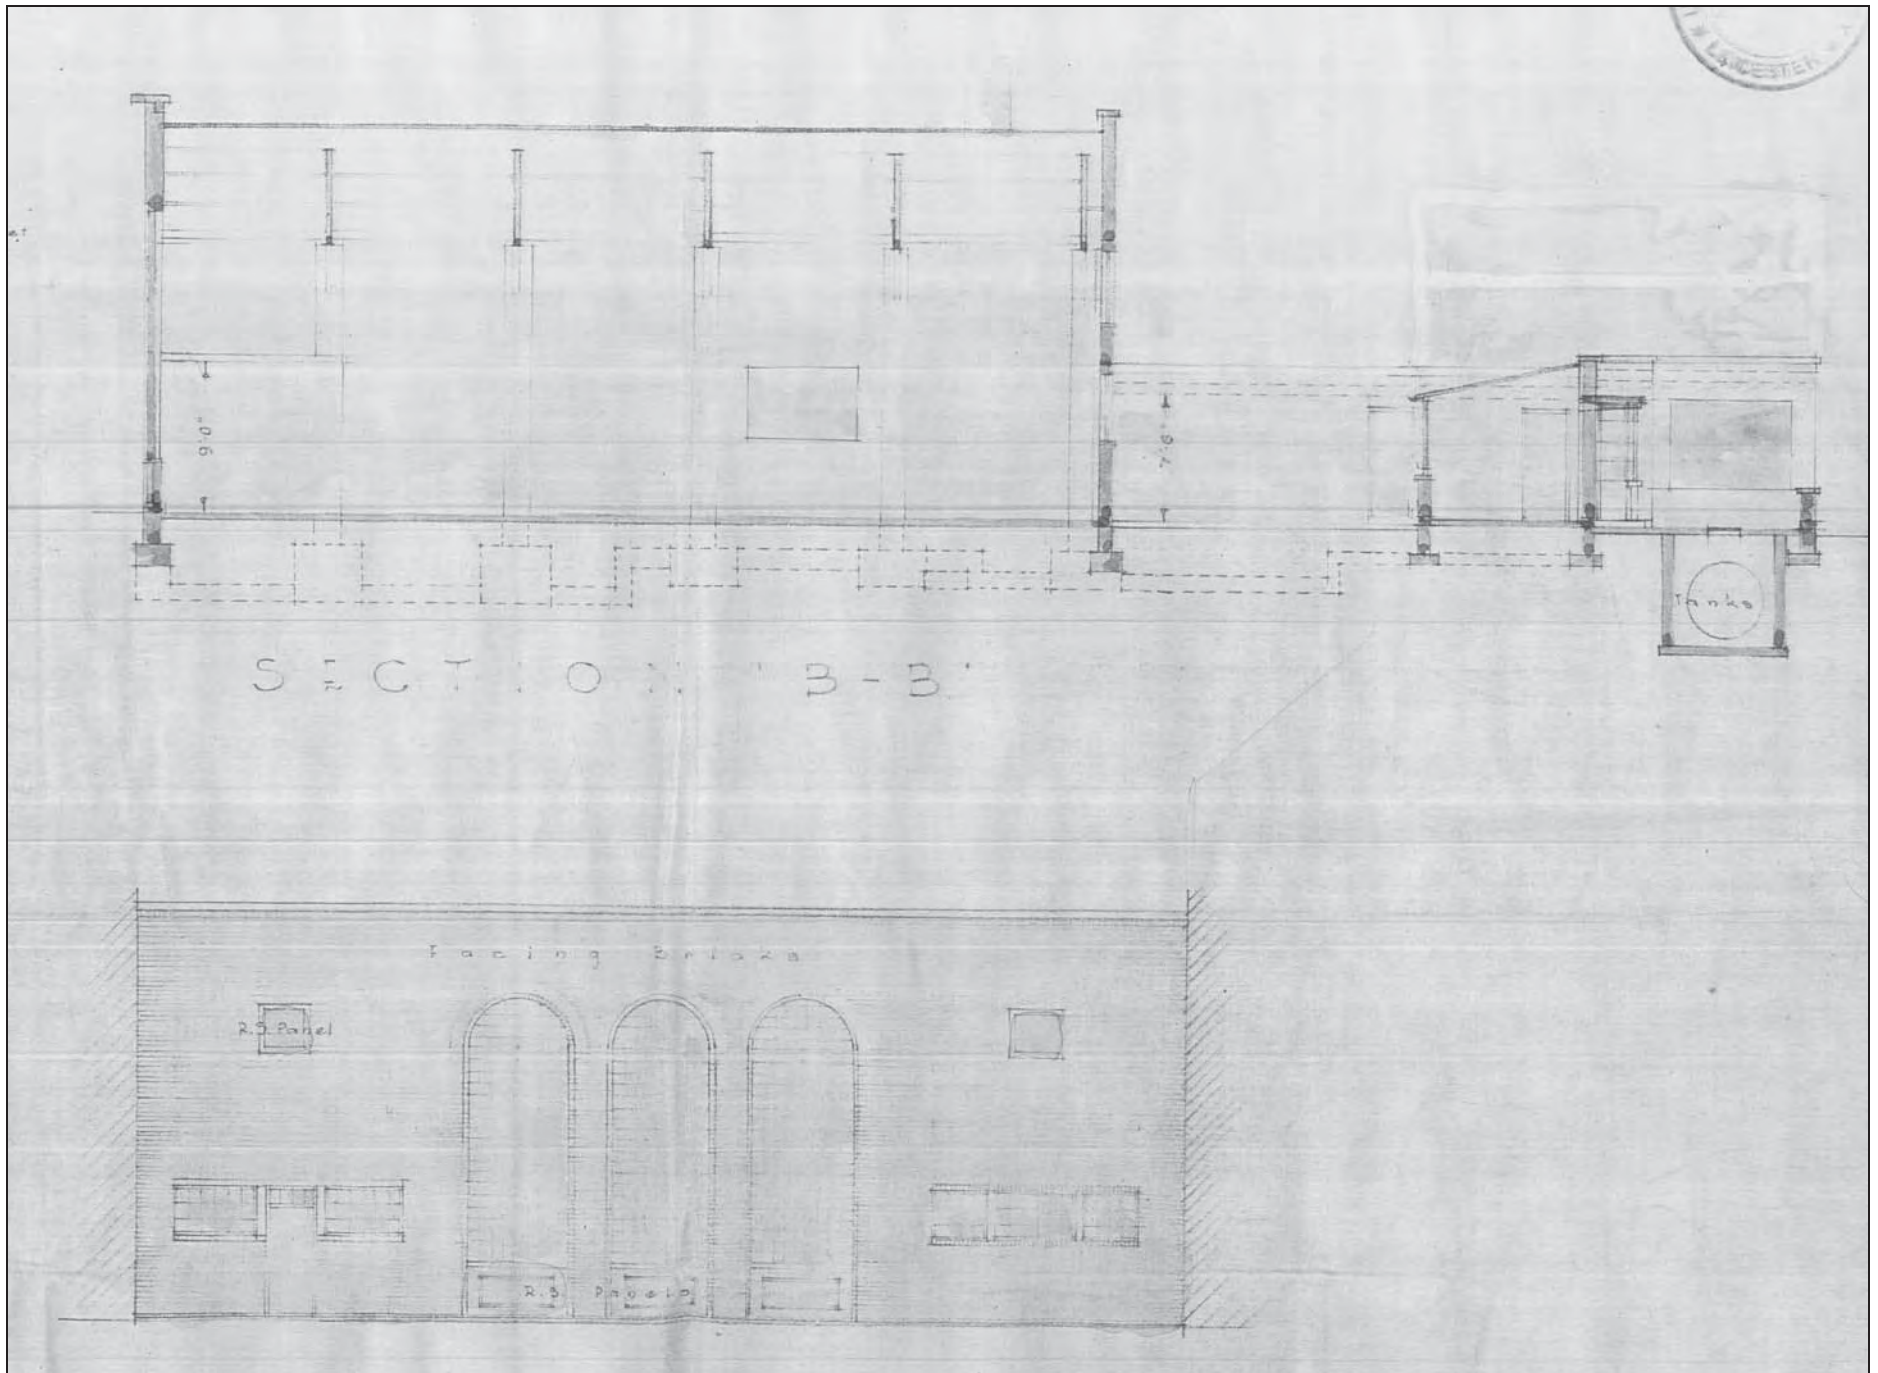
Cross section and New Walk Elevation of Sibson's Garage (Stockdale Harrison & Sons, 1951; taken from LBR Plan 76644)
